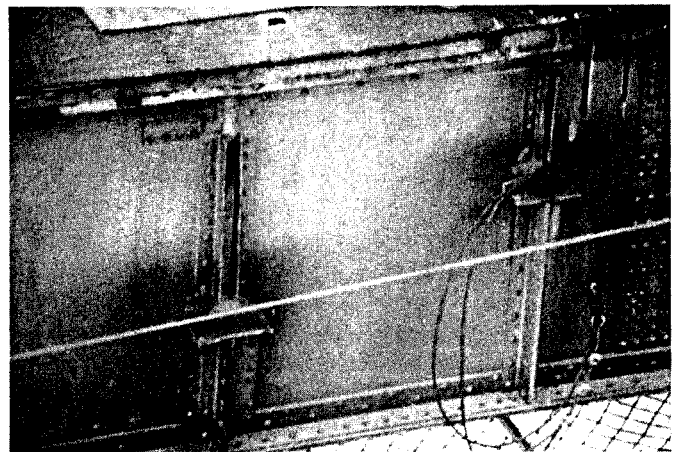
Typical beam seat and web alignment plates (Bay Bridge).
